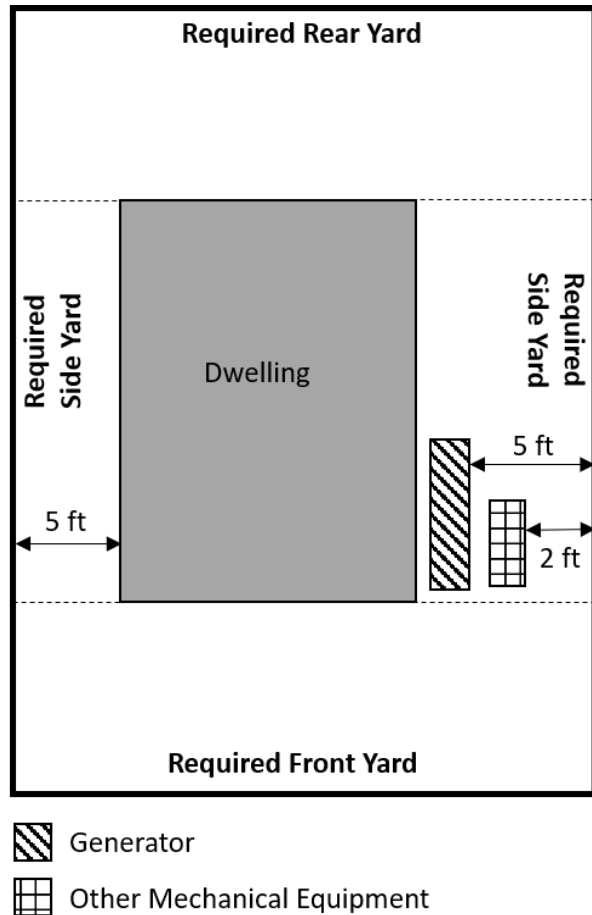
Proposed Side Yard Setback Restrictions for Mechanical Equipment (Not to Scale)
